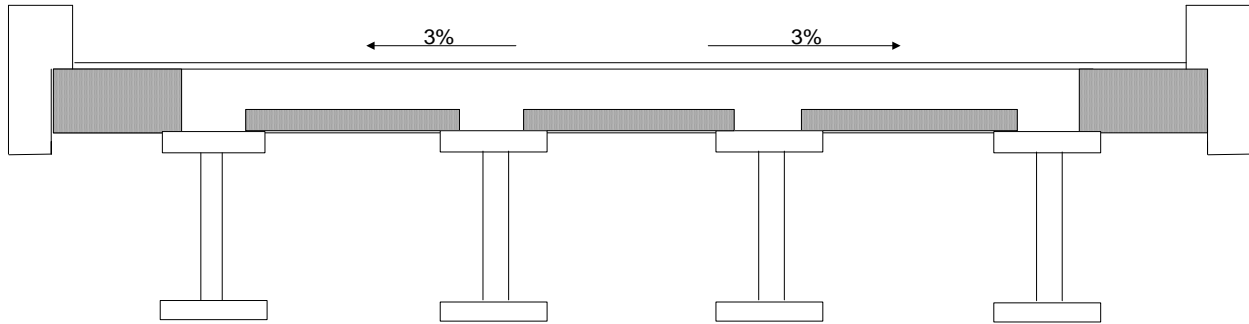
Cross-Section of a typical multi-girder bridge [7]
